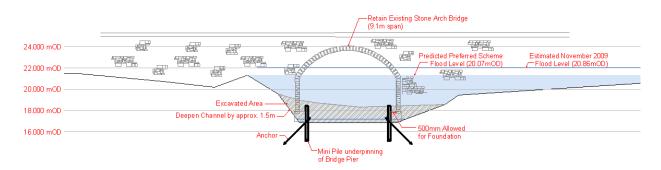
Proposed Works at the Railway Bridge in Craughwell
